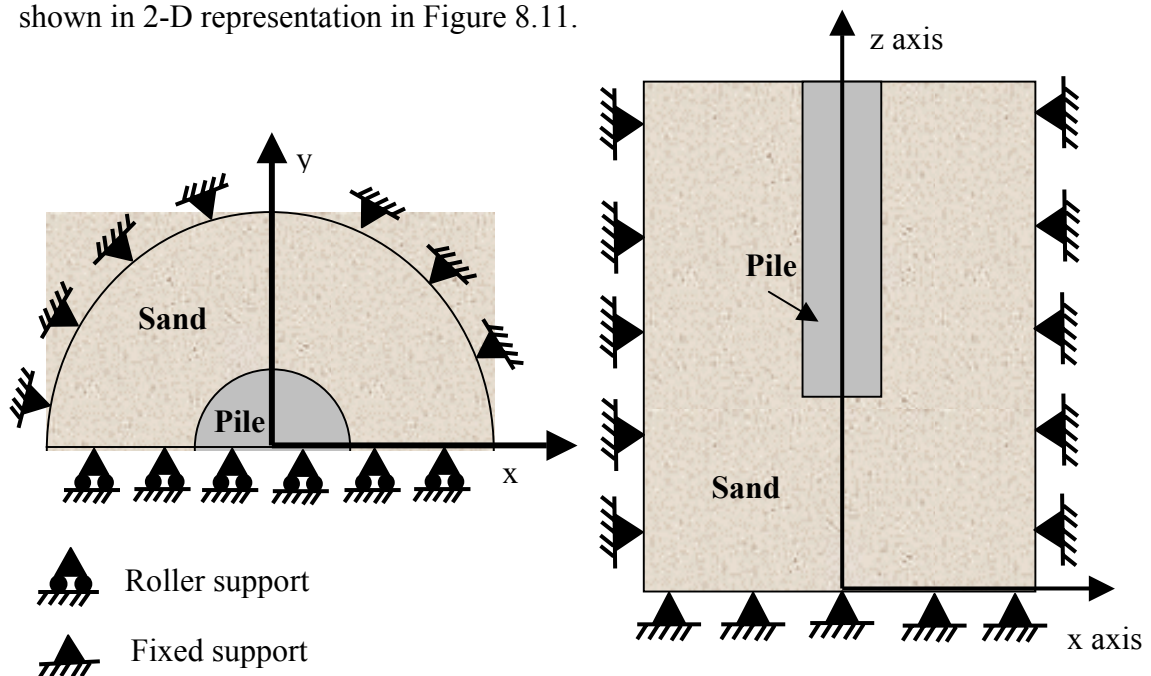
(a): Plan view of problem (b) Elevation view of pile-soil problem
